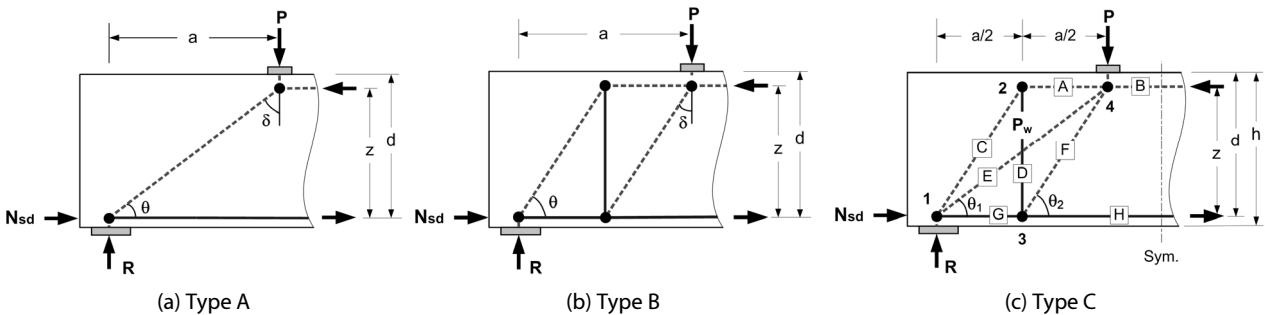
Strut-Tie Models for Prestressed Concrete Beams
